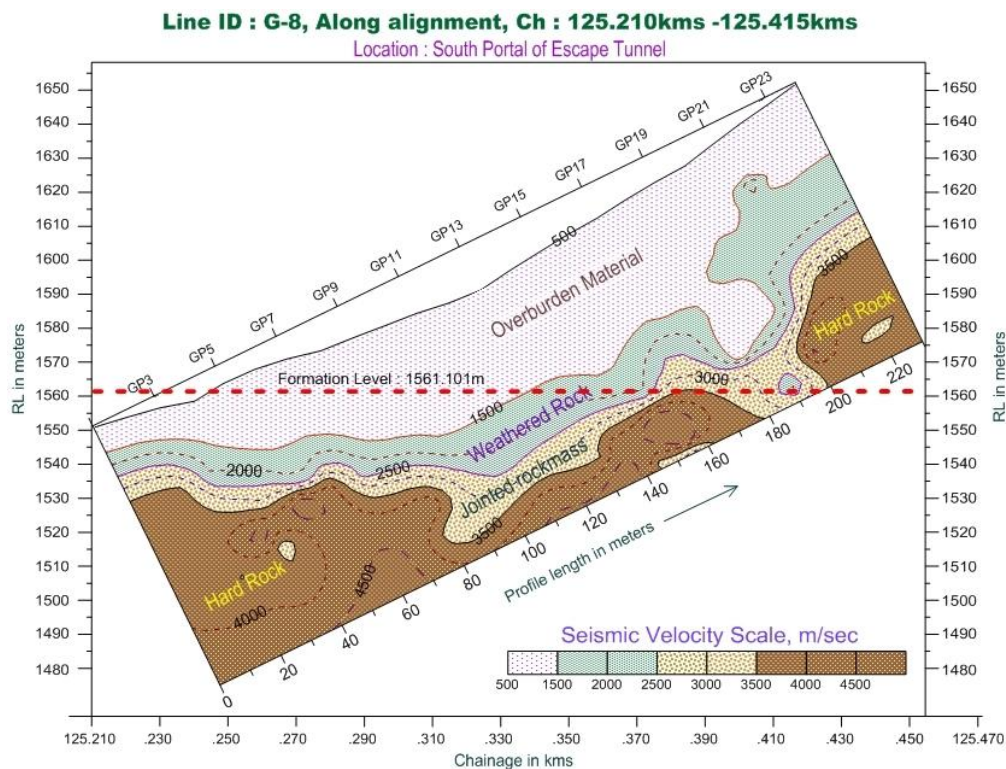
Section along line G-8 at the South Portal of Escape Tunnel.
